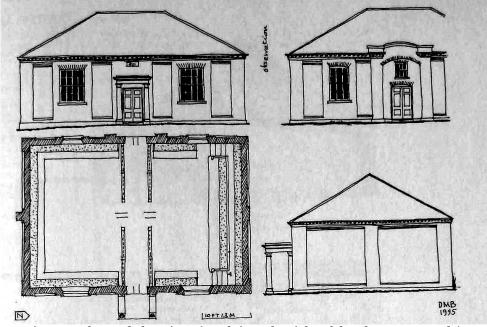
Plan and elevations (north is to the right of the plan; not to scale) (Butler (1999), vol. 1, pp. 185)
